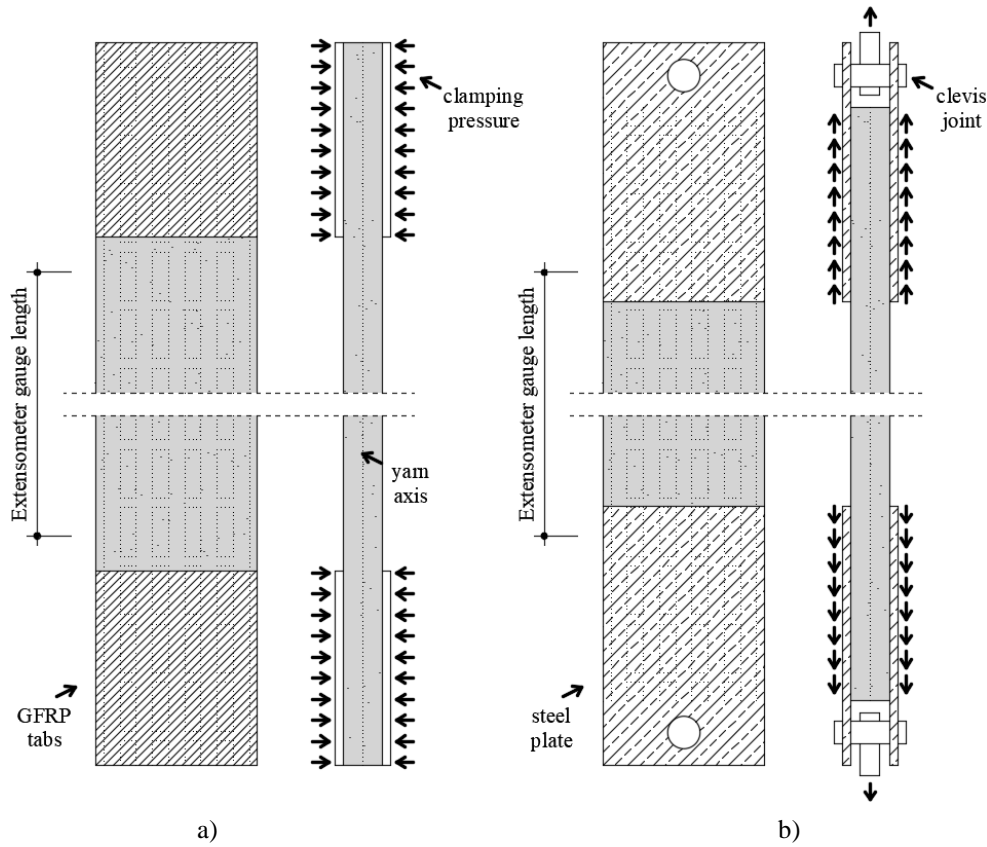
FRCM tensile test set-ups: a) clamping grip; b) clevis-grip set-up.
